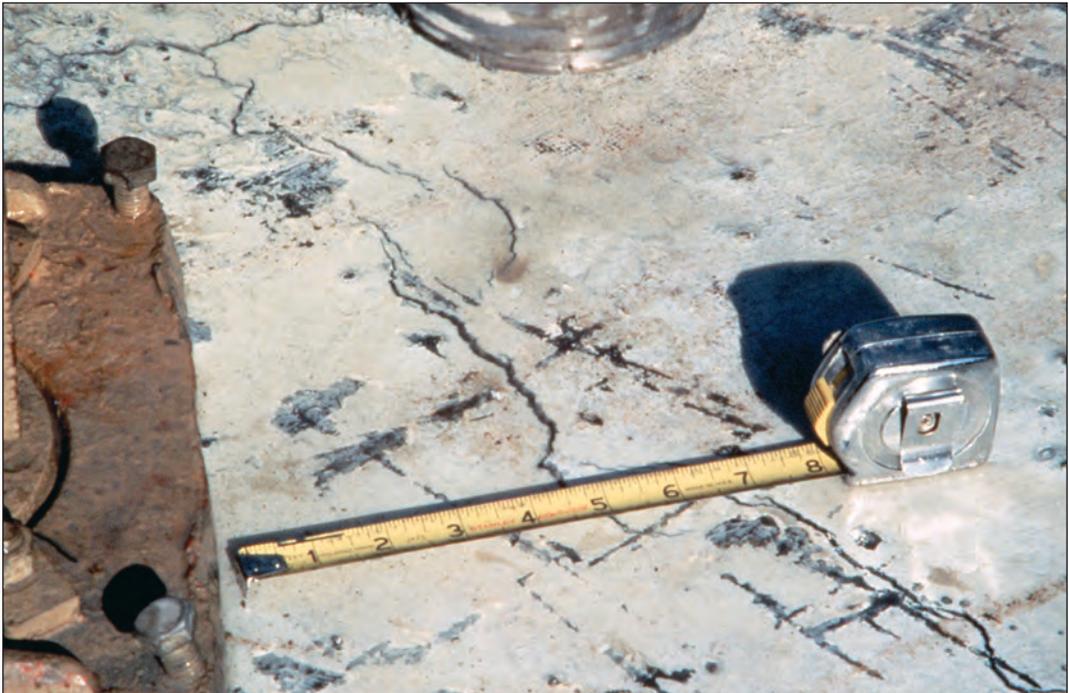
Plastic shrinkage cracks in silica-fume concrete.
